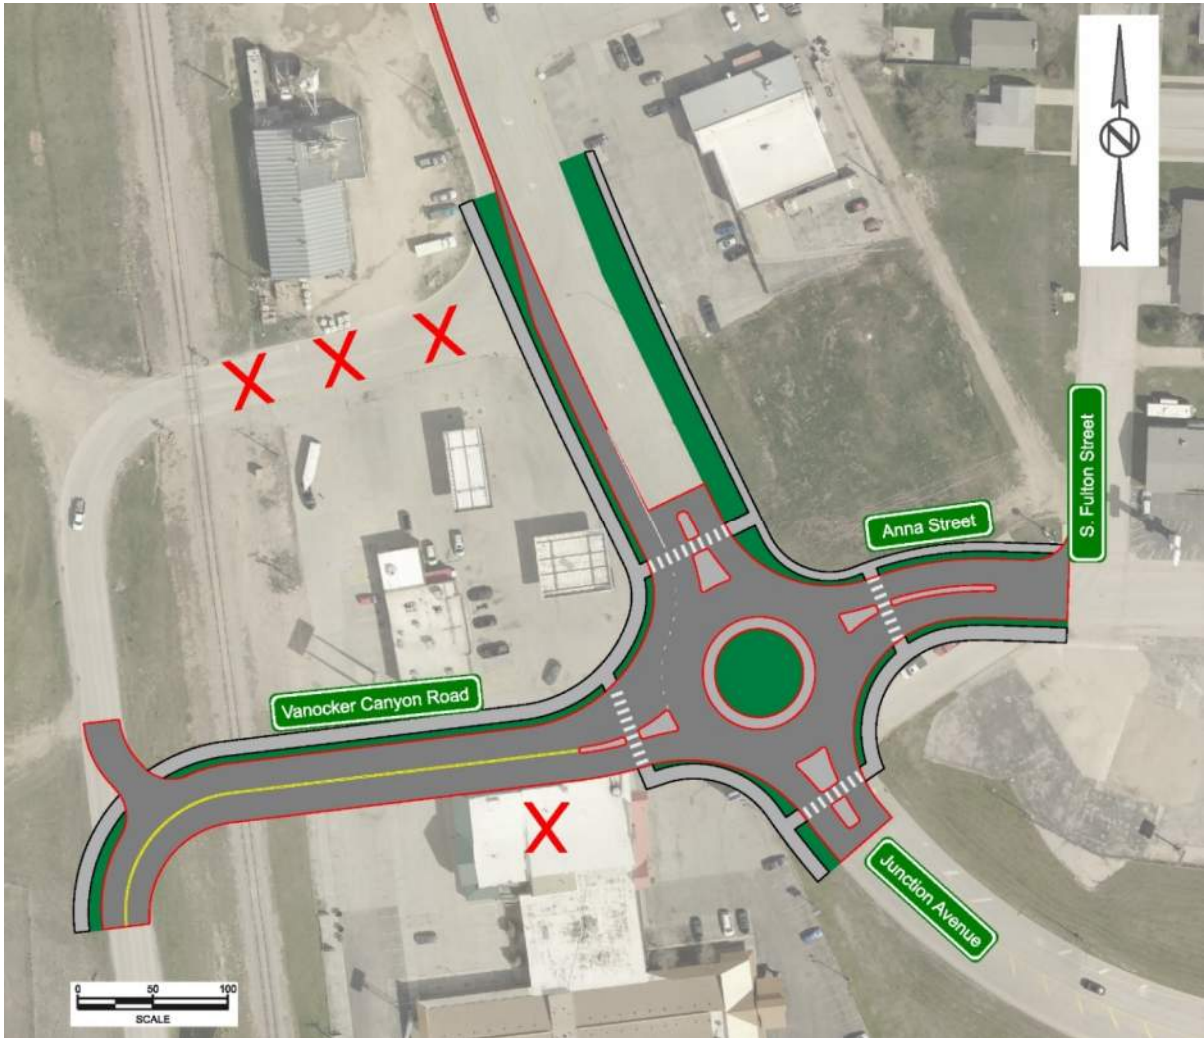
Realignment of Vanocker Canyon Road to Anna Street (Roundabout)
